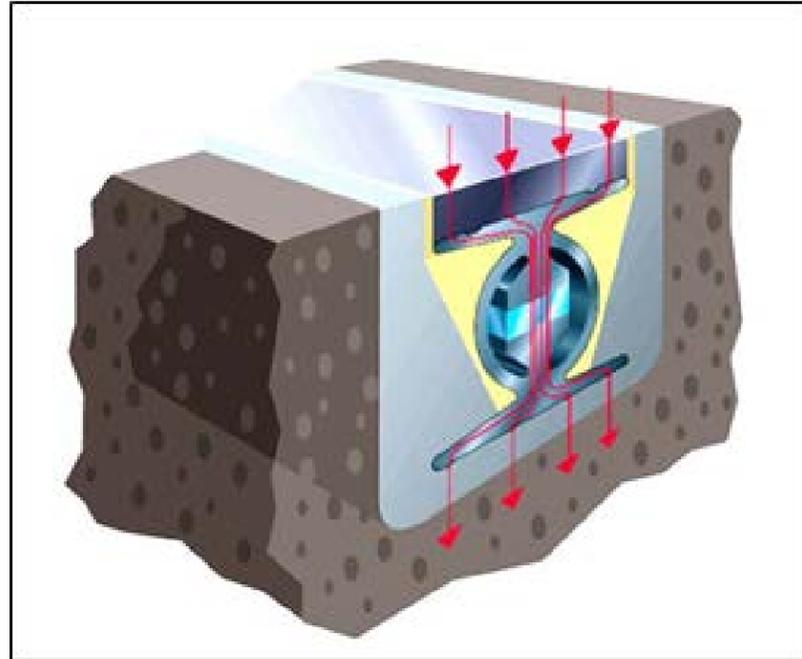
Cross Section of Piezoelectric WIM Sensor Installed in Asphalt.
